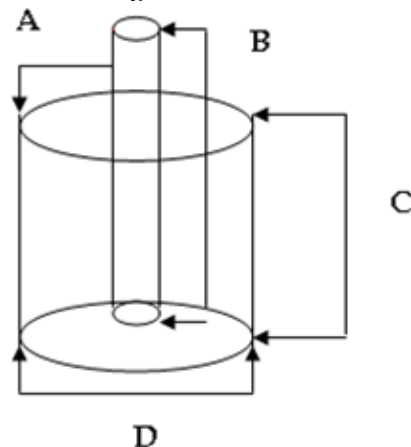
Specimen design showing overlay thickness, height of steel bar as variables and height and diameter of concrete sample as constant.
